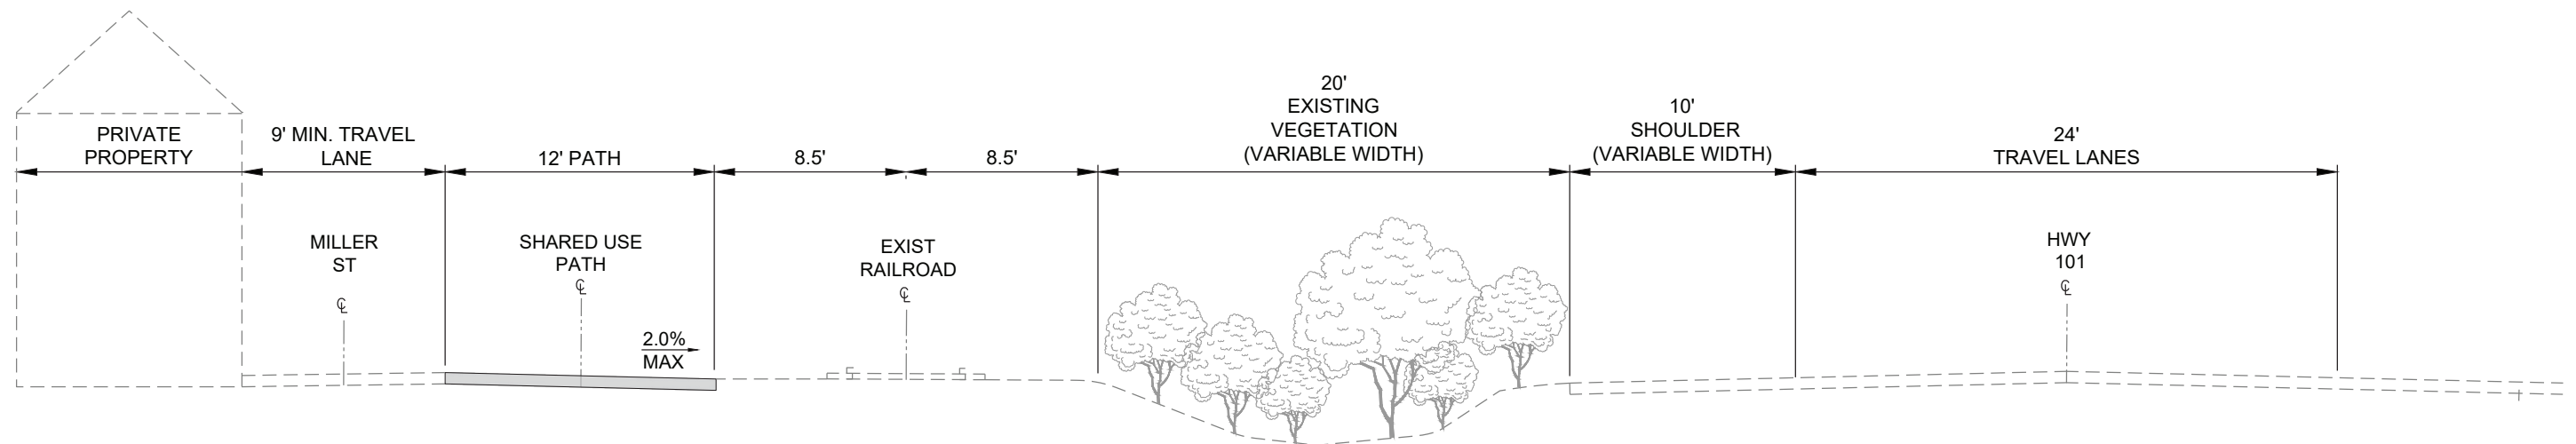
Saltair Creek Bridge to S 4th Avenue
